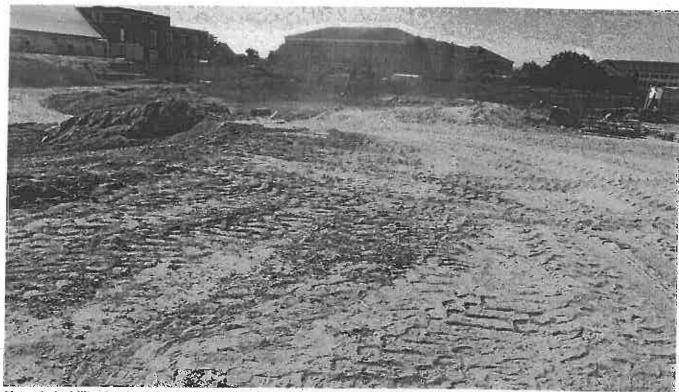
Stabilize Construction Entrance without aggregate stones tracking mud on paved road SW site of site
